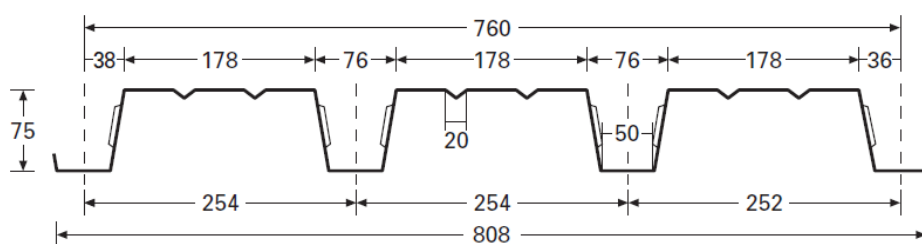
Trapezoidal steel deck used in the HI-BOND A 75/760P
